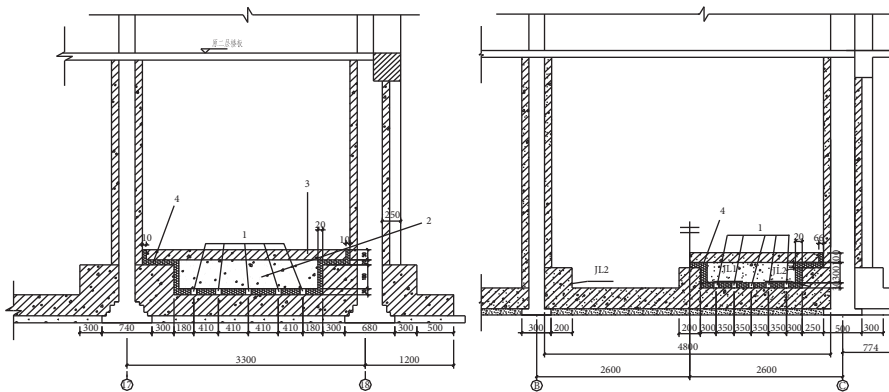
Cross section of the vibration isolation system. Note. 1: rubber vibration isolator; 2: C20 plain concrete layer; 3: ordinary indoor floor; 4: polymer foam board.
